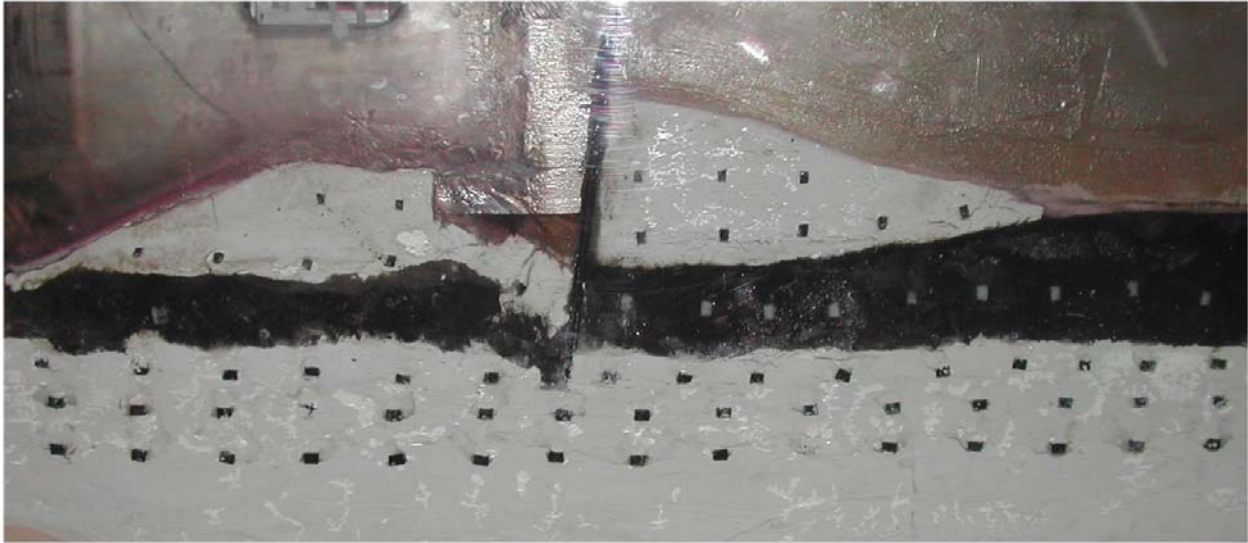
Final state of 17th Street Model 1 showing lateral translation on sliding surface starting at the toe of the wall and progressing landward.
